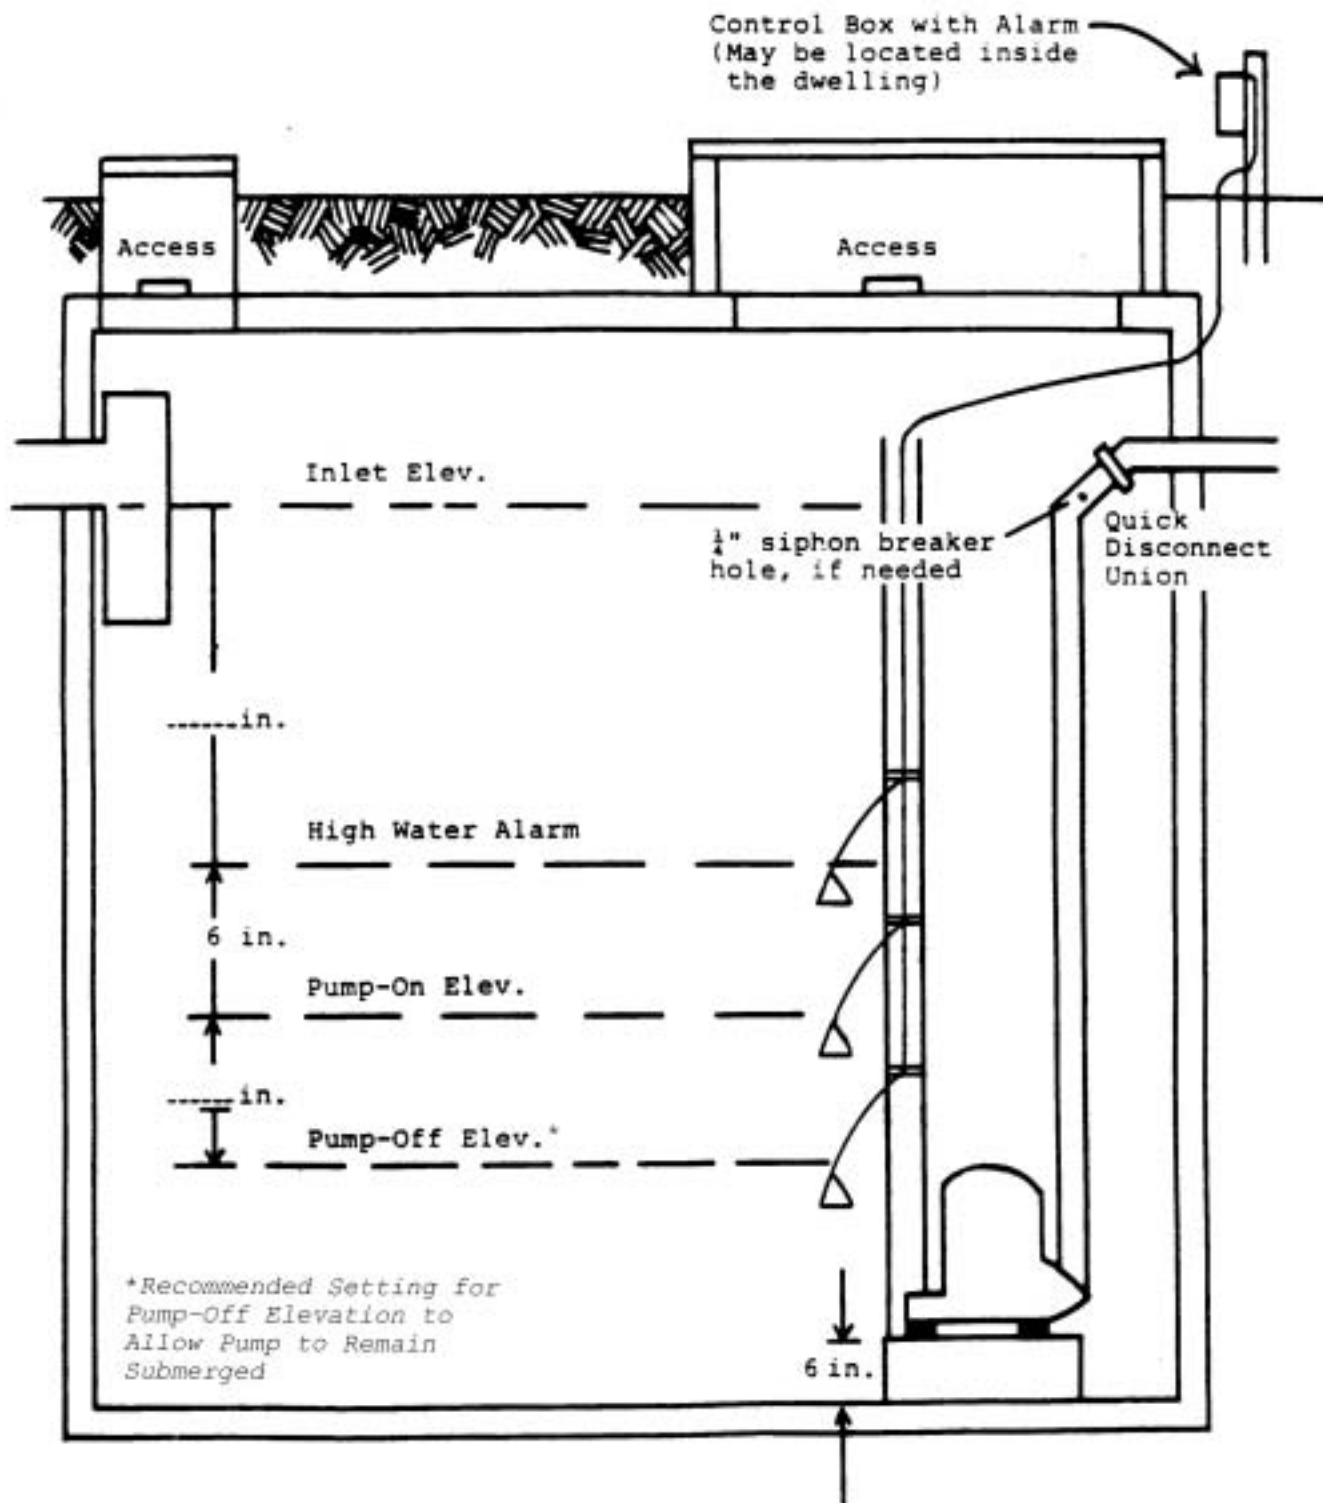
TYPICAL PUMP CHAMBER DETAIL
